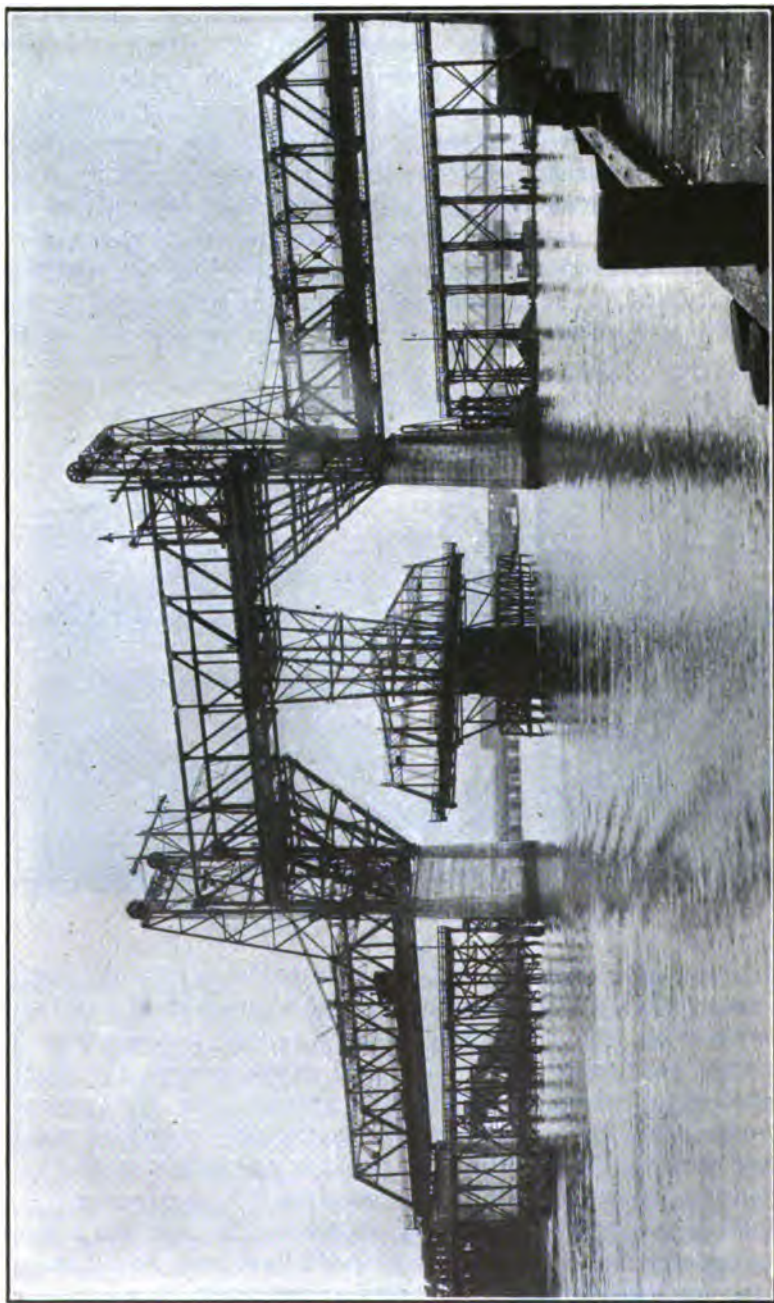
OLD TACOMA PIER DURING ERECTION OF NEW BRIDGE.
